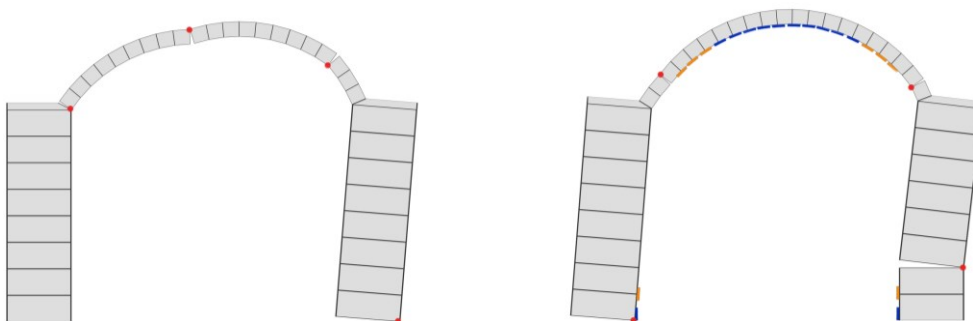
Collapse mechanism for a unreinforced (left) and reinforced (right) of a masonry arch on supports.
